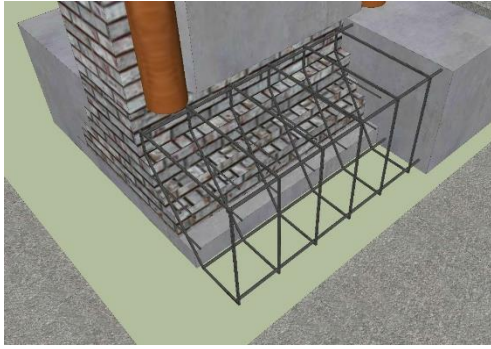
Foundation reinforcement (self-painted) Fig. 7. Wall reinforcement (self-painted)
